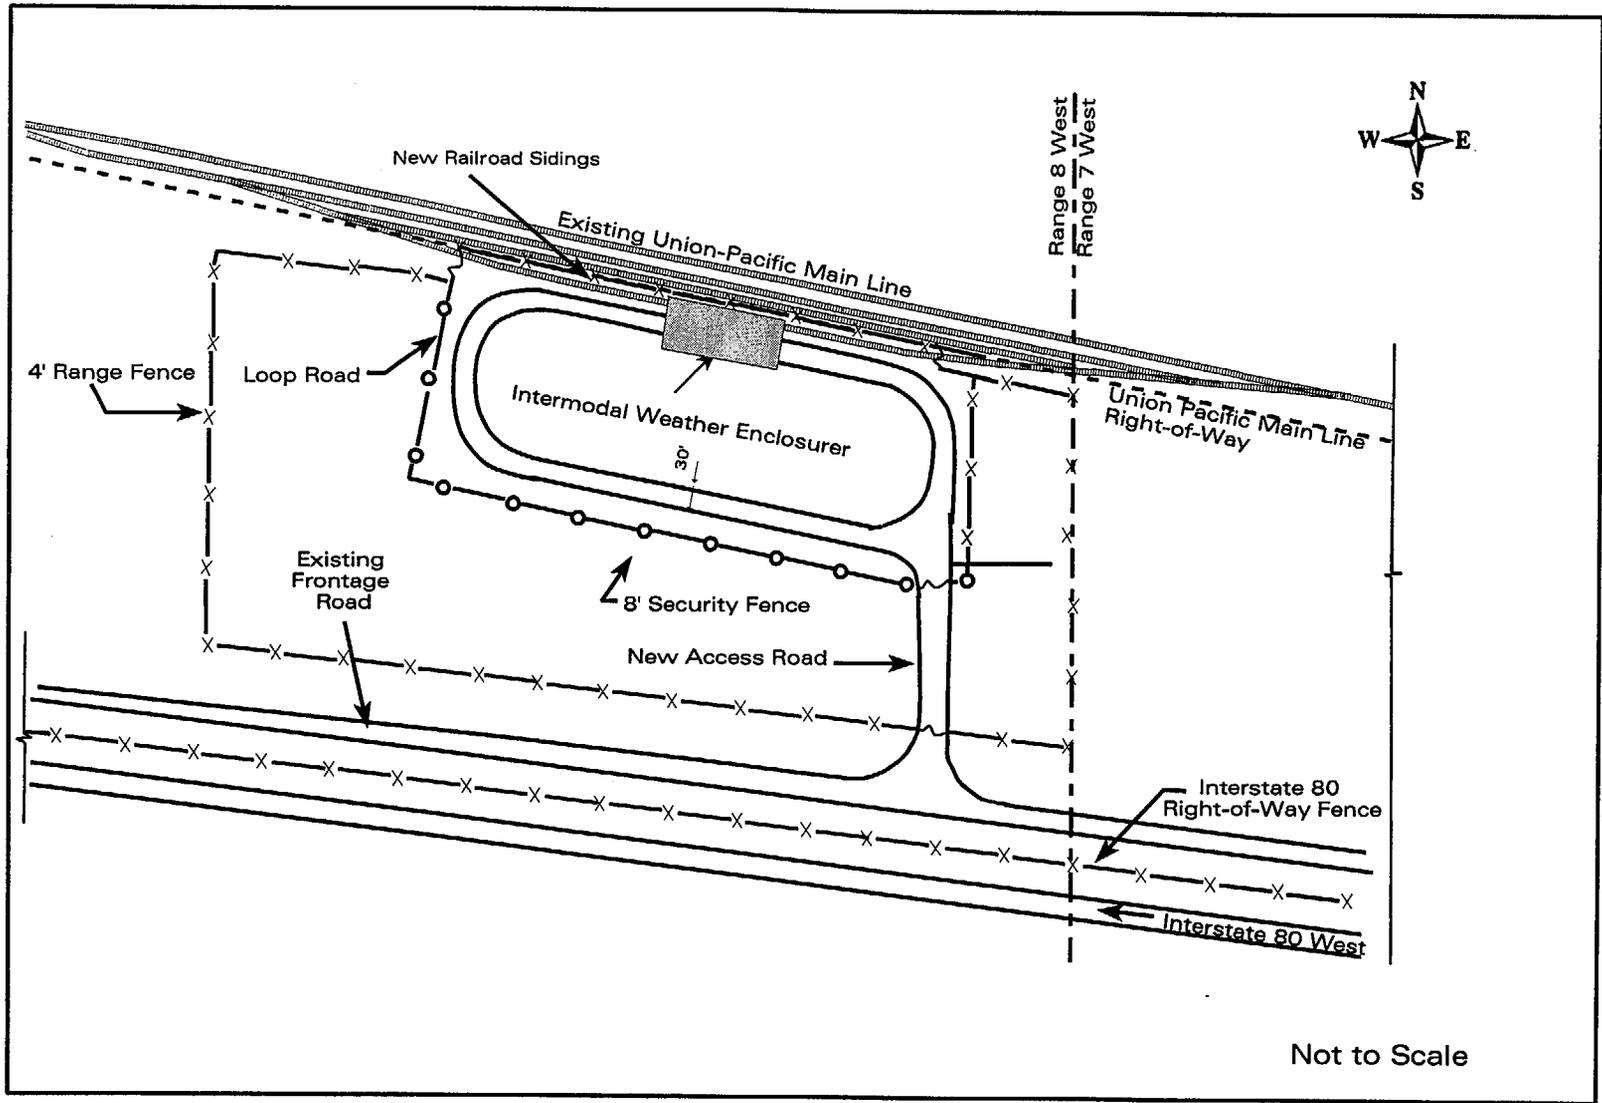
Basic site plan and layout for the Intermodal Transfer Facility.
